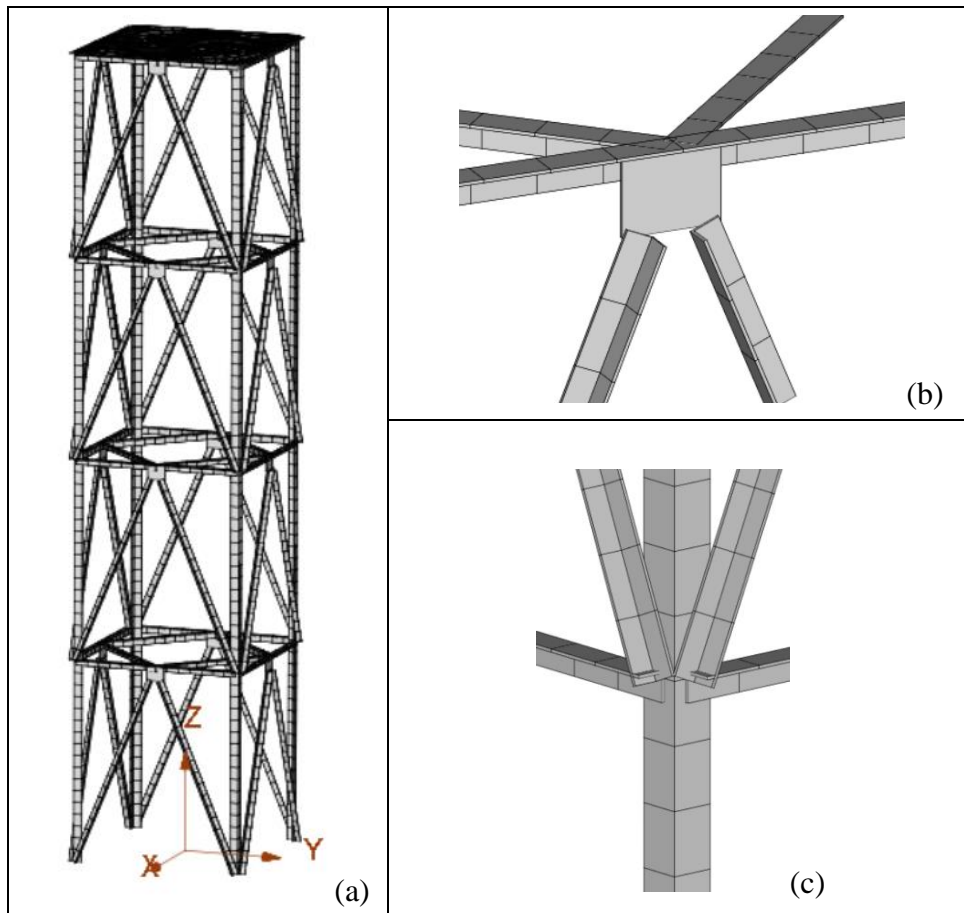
(a) 3-D tower model at Level IV approach, (b) Detail of connection between horizontal and vertical bracings, (c) Detail of connection between vertical bracings and leg
